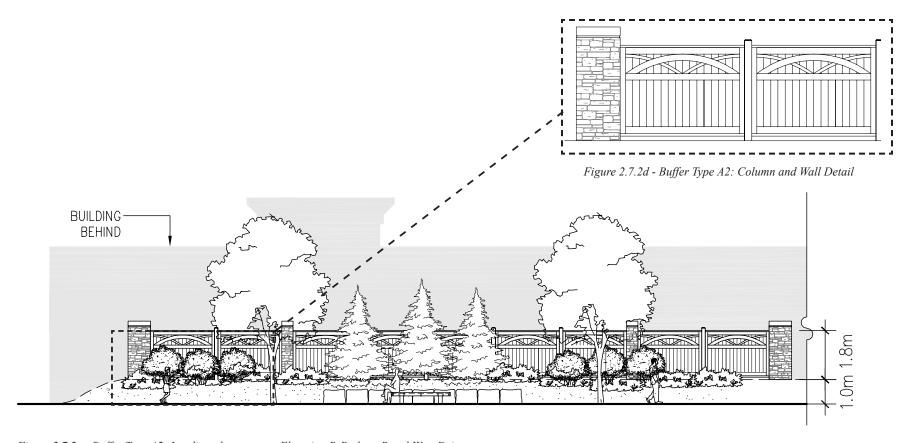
Buffer Type A2: Loading along street - Elevation B-B along Royal West Drive
